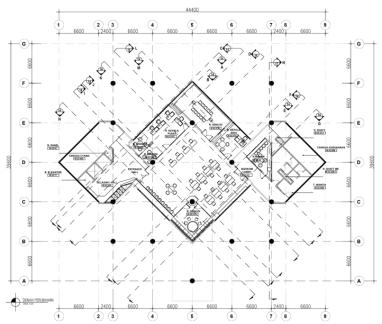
Floor Plan of the Marketing and Relations Departments (Source: author, 2024)
